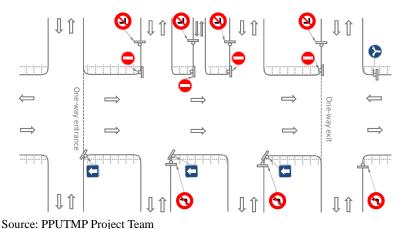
Conceptual Image of Traffic Signs Installation for the One-way Traffic Operation
